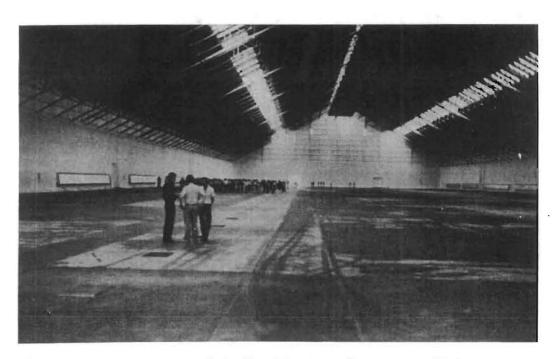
An interior view of the No. 1 horizontal storage at Kwinana.
